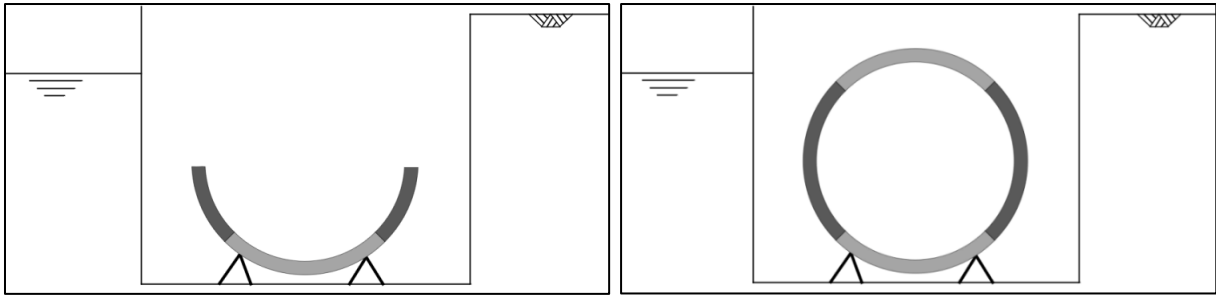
The full cross section of the sphere is printed. Prefab elements (light grey) are used for the bottom and top as this cannot be printed without formwork, due to a large cantilever.
